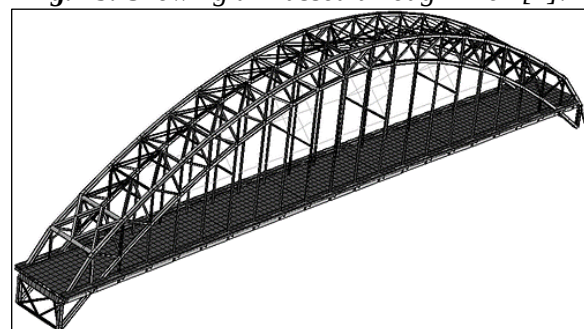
Showing an Arch Truss over a through Type Truss Bridge [4].
